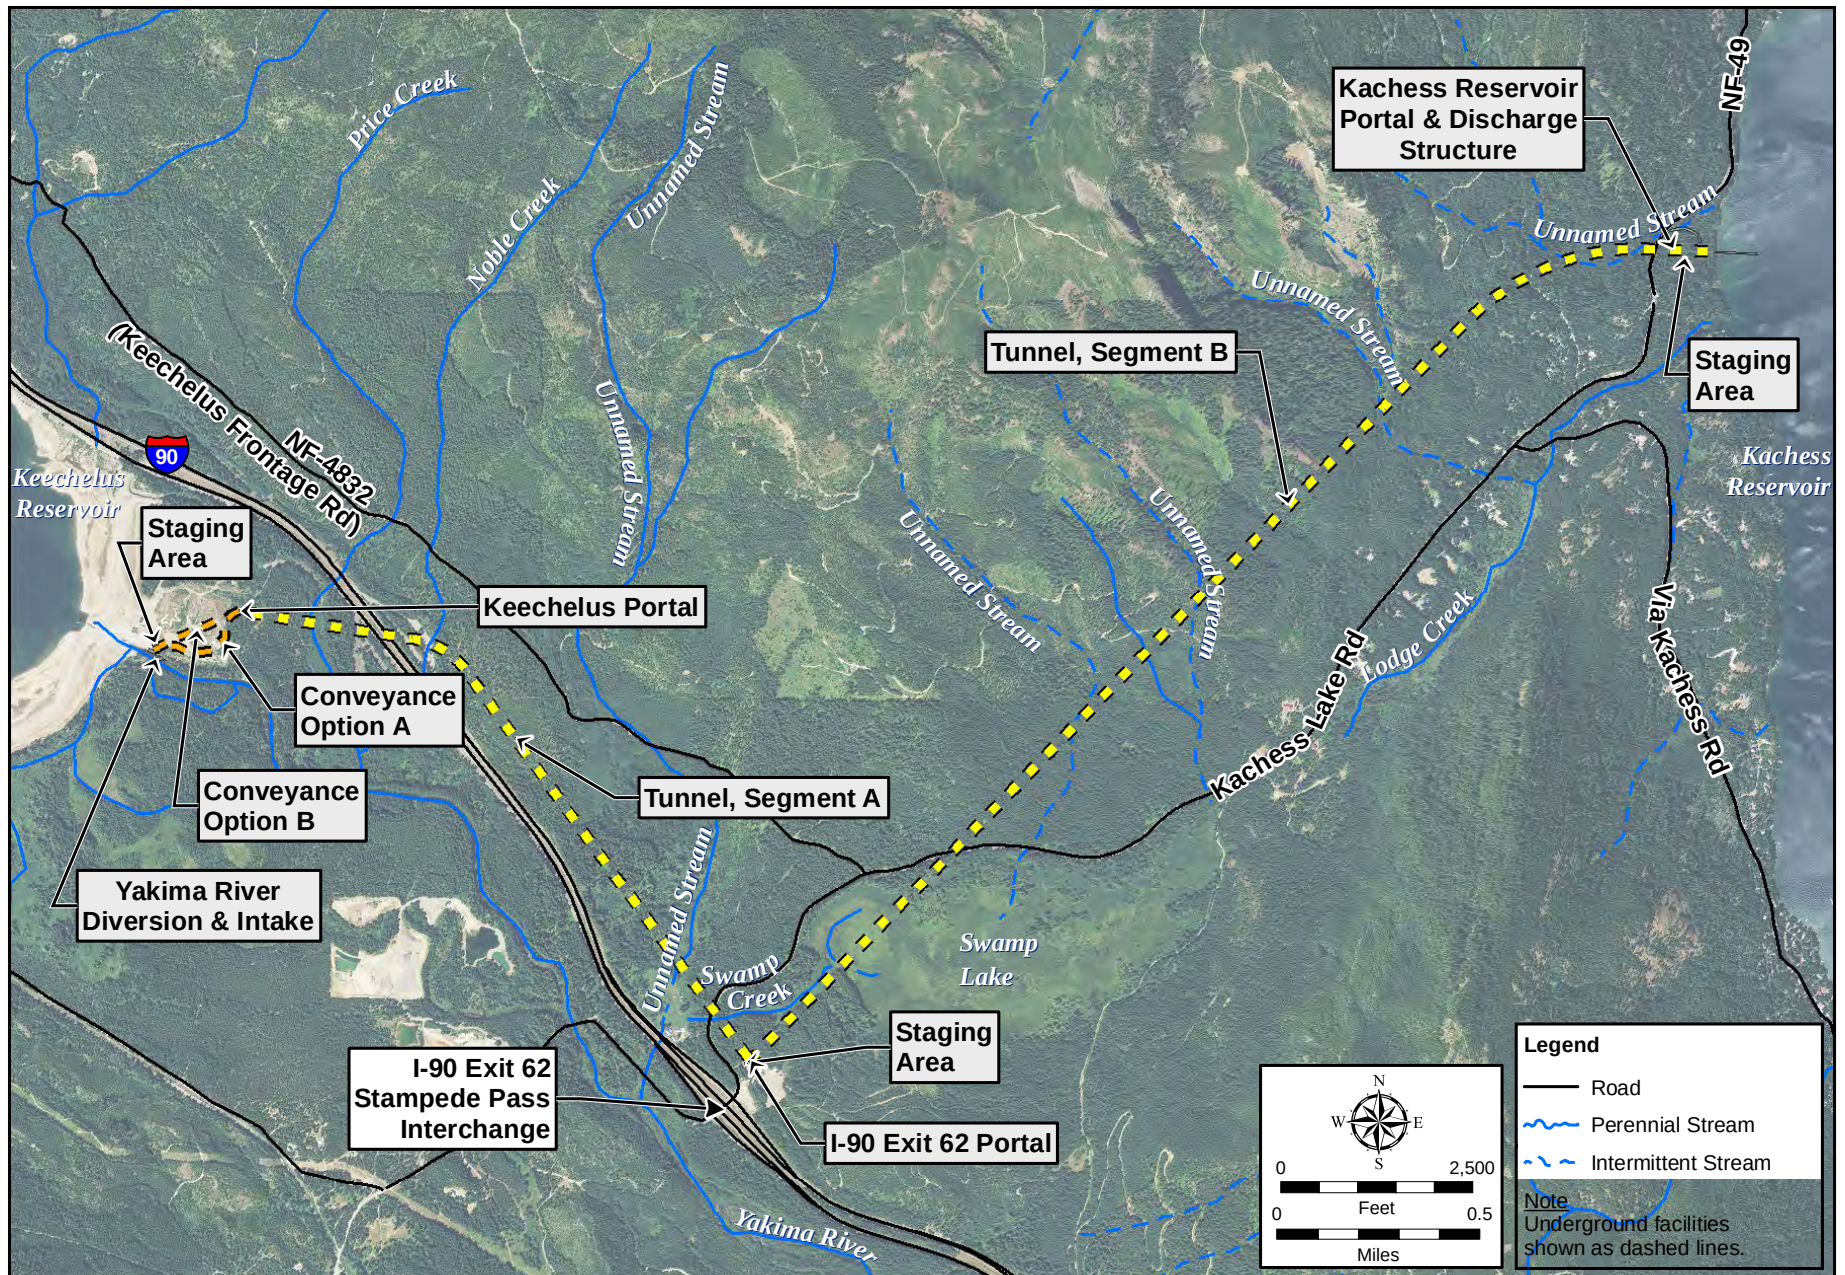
Alternative 3B – KKC South Tunnel Alignment Overview
